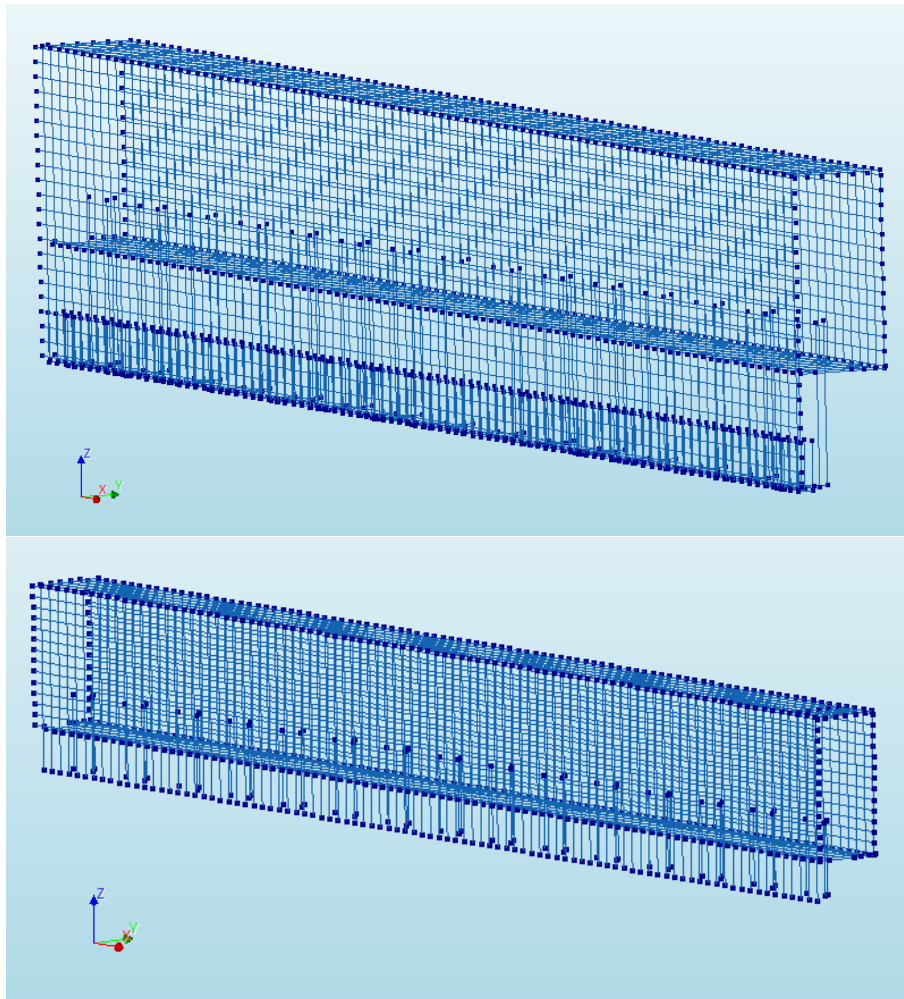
Modelled stirrups and longitudinal bars of the structure for conventionally reinforced concrete (top) and fiber reinforced concrete (bottom). Model with fiber reinforcement has less reinforcement bars in the capping beam extension.
